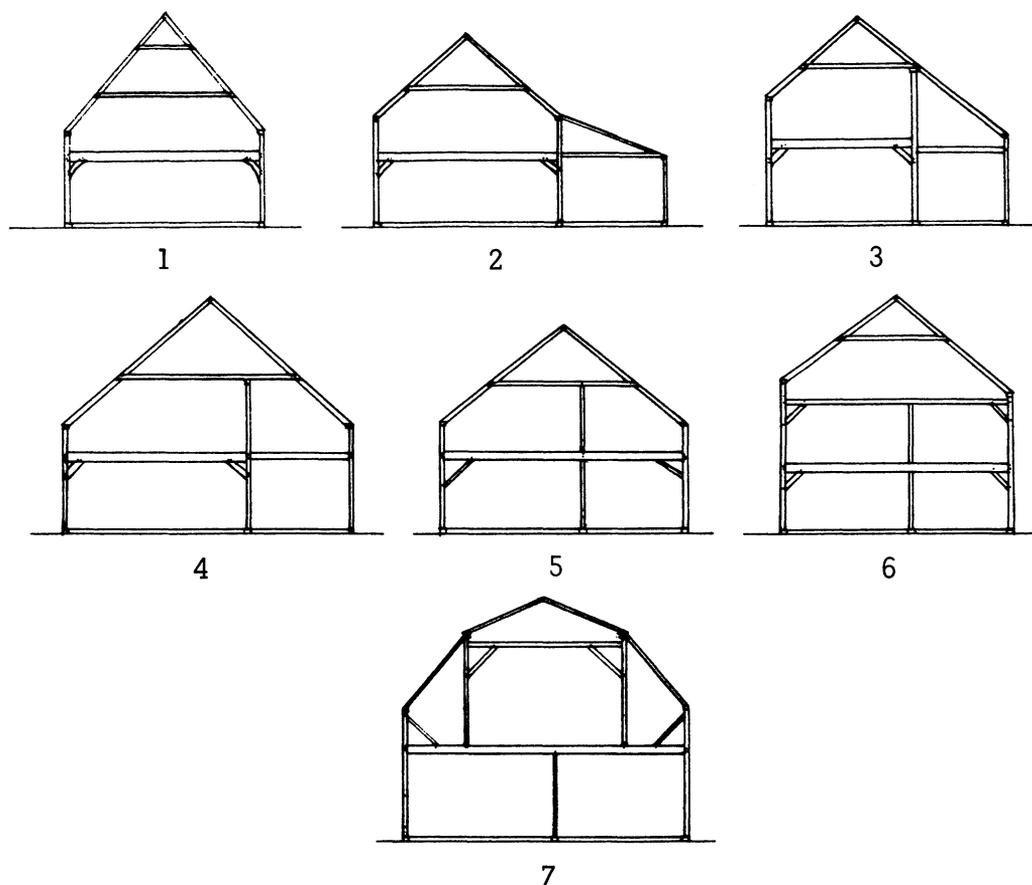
Dutch American anchor-bent framing types (see table 1). (Drawing, based on actual buildings, C. W. Zink.)
